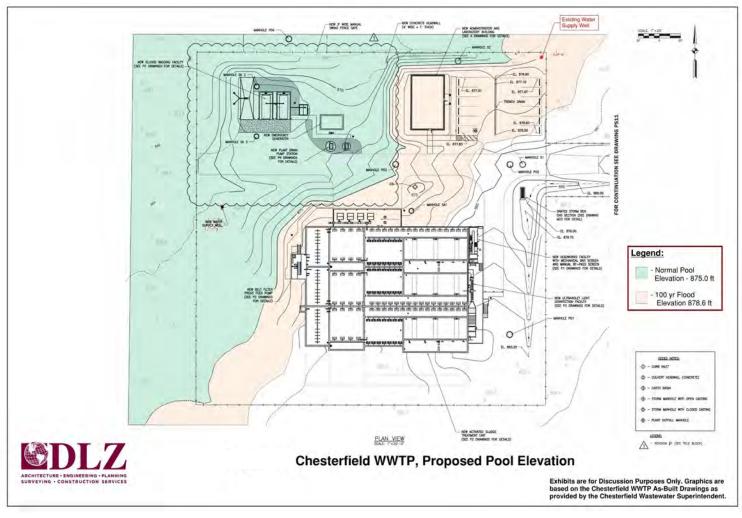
Chesterfield WWTP Proposed Pool Elevation
